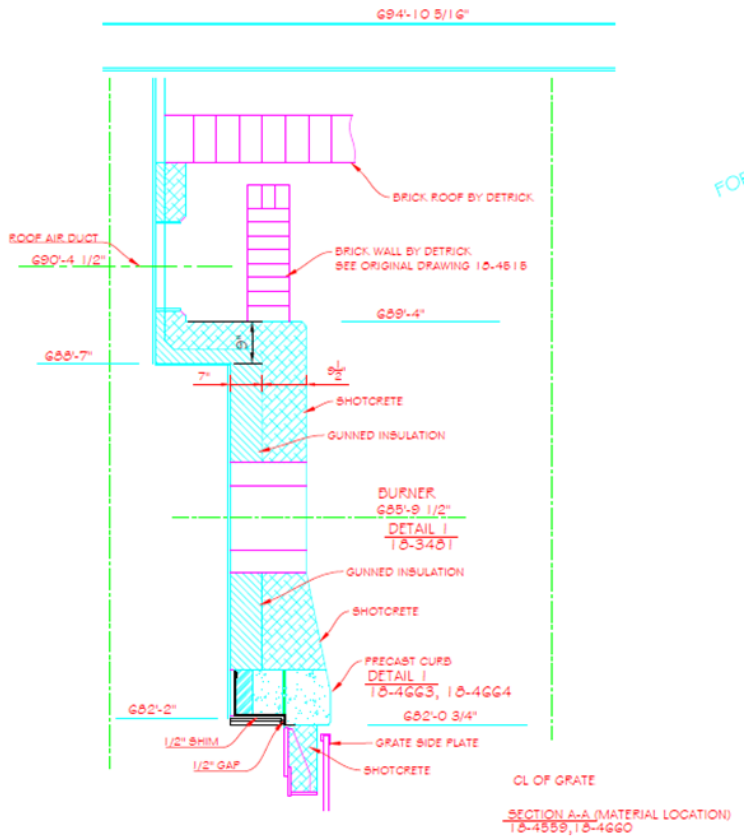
Drawing Cross Section of Original Design of Refractory Lining – Furnace No. 12
